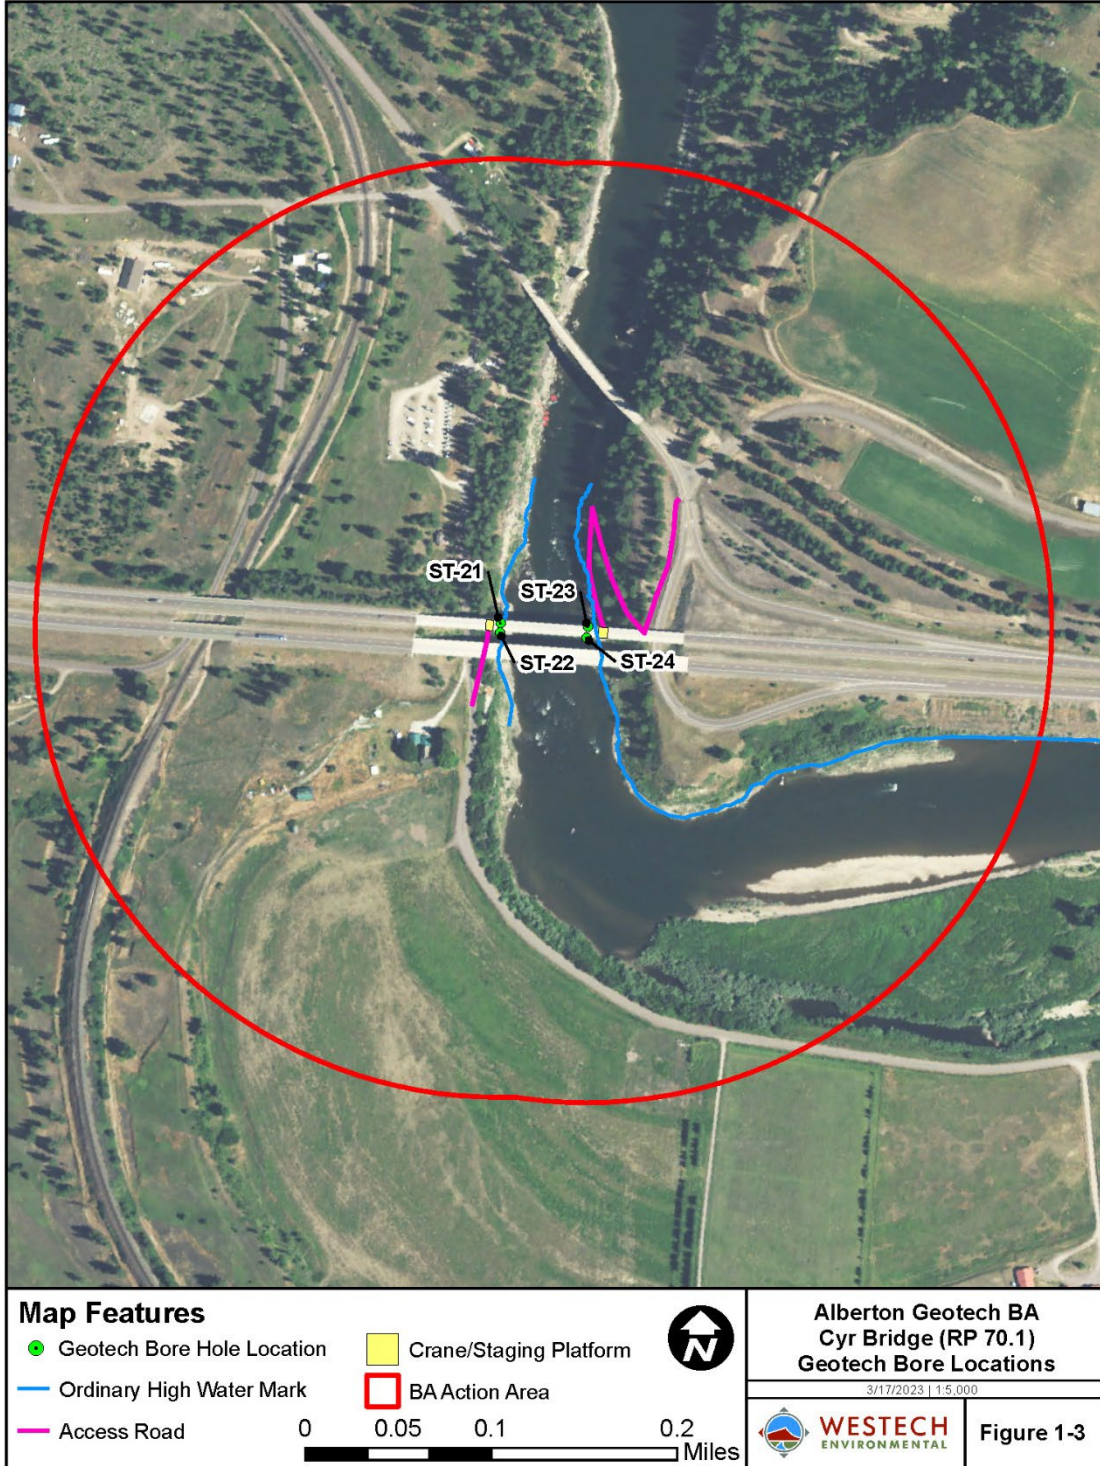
Cyr Bridge Geotech Borehole Locations
